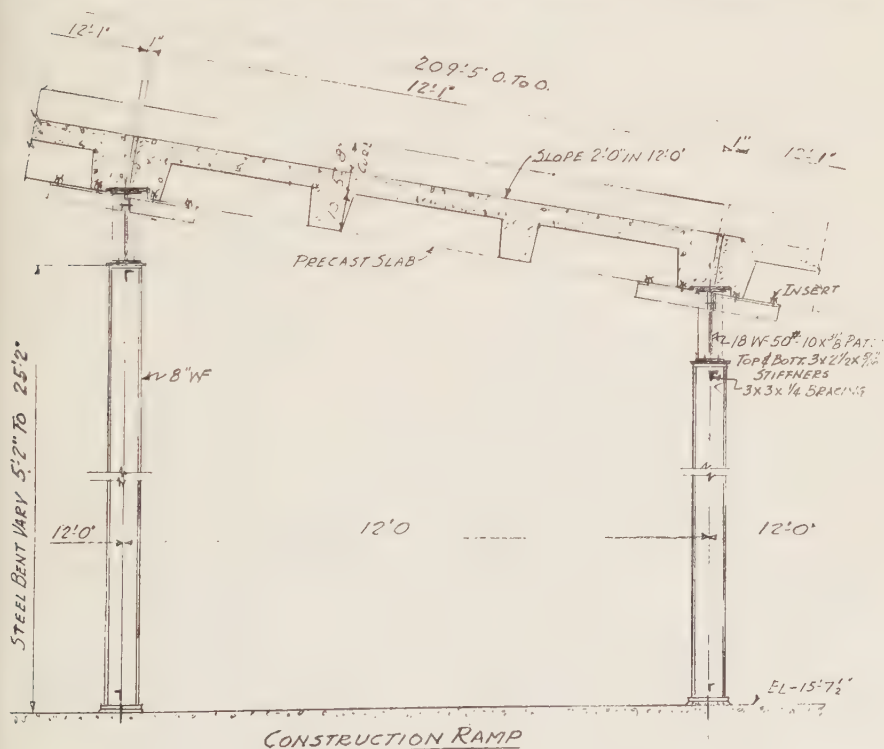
TYPICAL SECTION OF PRECAST CONCRETE RAMP.
